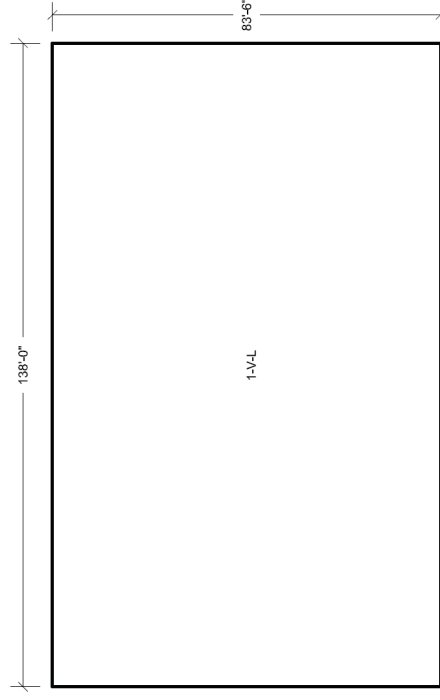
H.6-93: LHS BASIN EAST WALL LOOKING WEST
